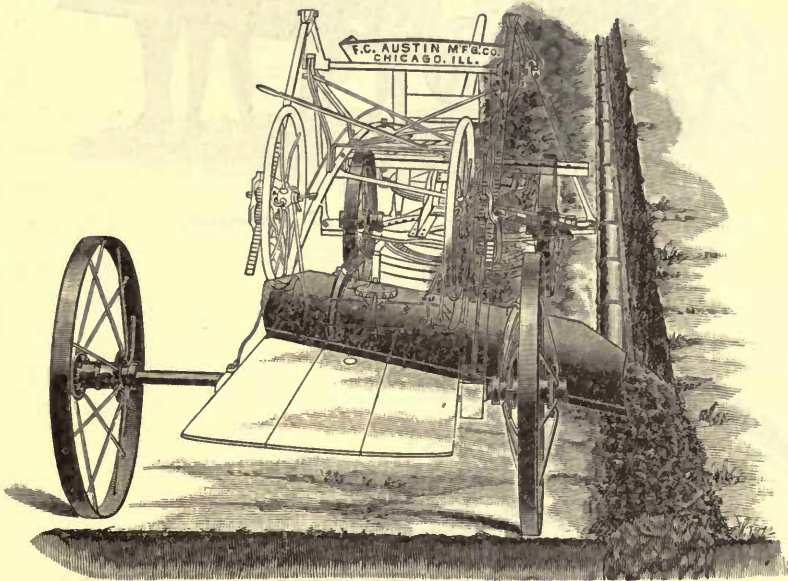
Road-machine or grader refilling earth over pipe drain.
